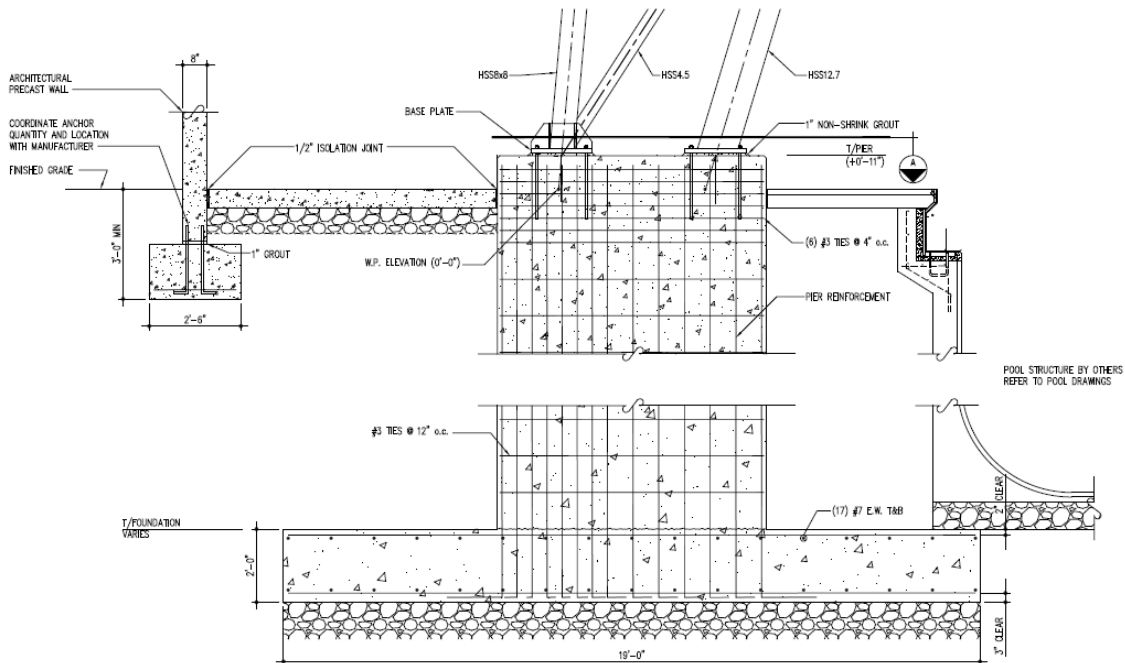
Detail of Pier Supporting Large Tapered Truss Column
